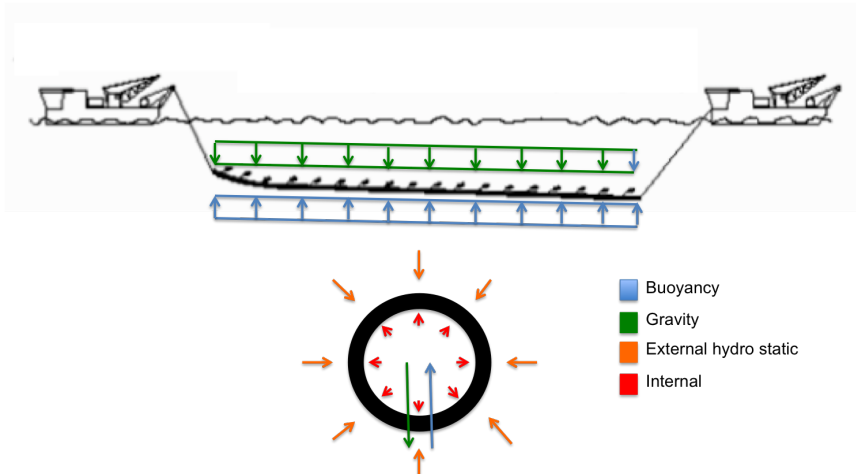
Static forces on a submerge towed pipe structure (DNV 2014a) (adapted)
